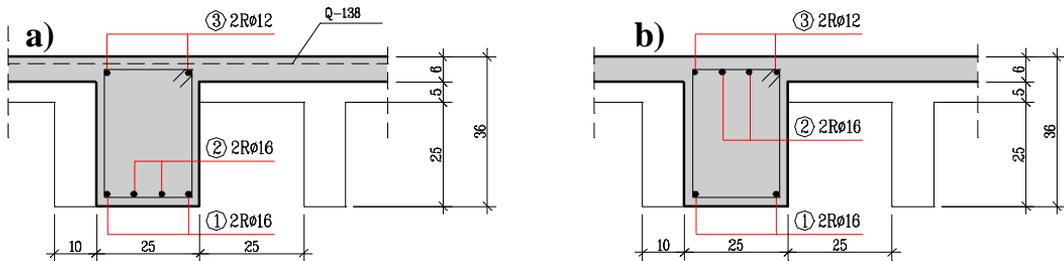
The new beam reinforcement plan: transversal cross-sections: a) in the span; b) in the support zone
